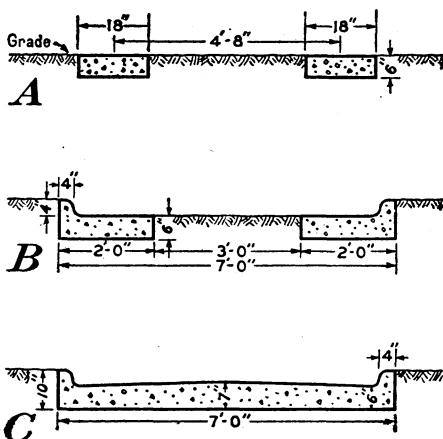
Types of driveways: A, Plain strip; B, curbed strip; C, full paved.
